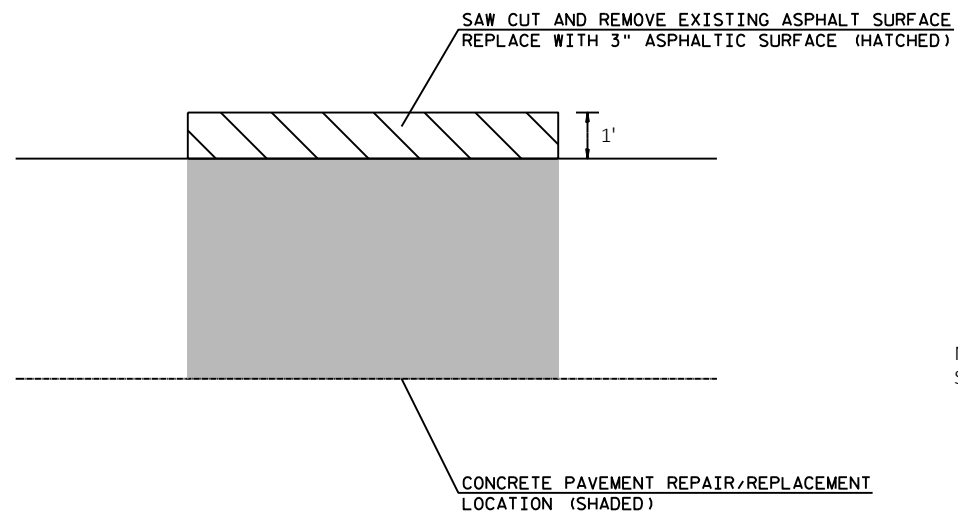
DETAIL FOR TYPICAL SIDE ROAD AND MEDIAN CROSSOVER SHOULDER PAVING LIMITS
